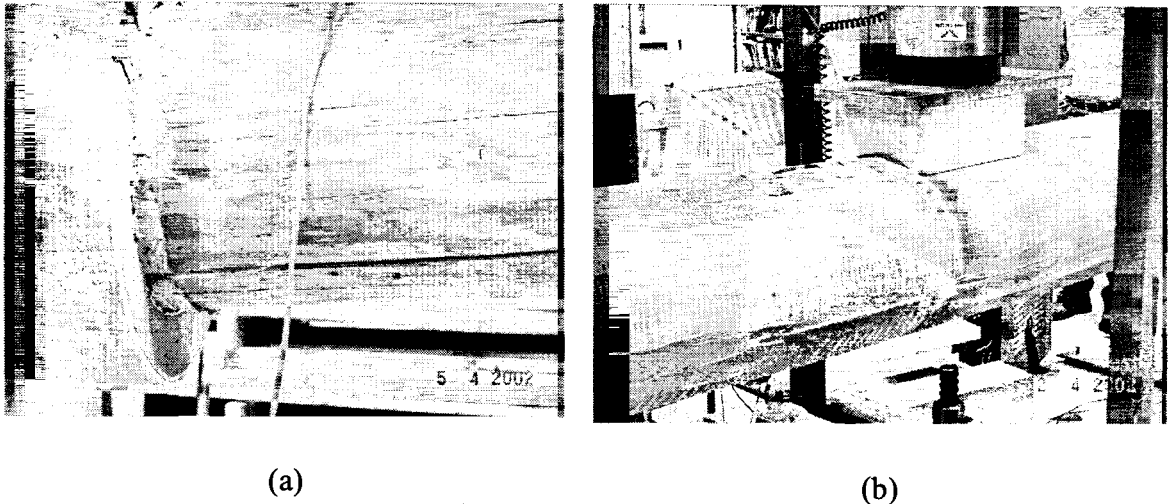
Failure modes: (a) Tension failure in wood pile at shield end (repair system B); (b) Compression failure in FRP composite shield (repair system C).
